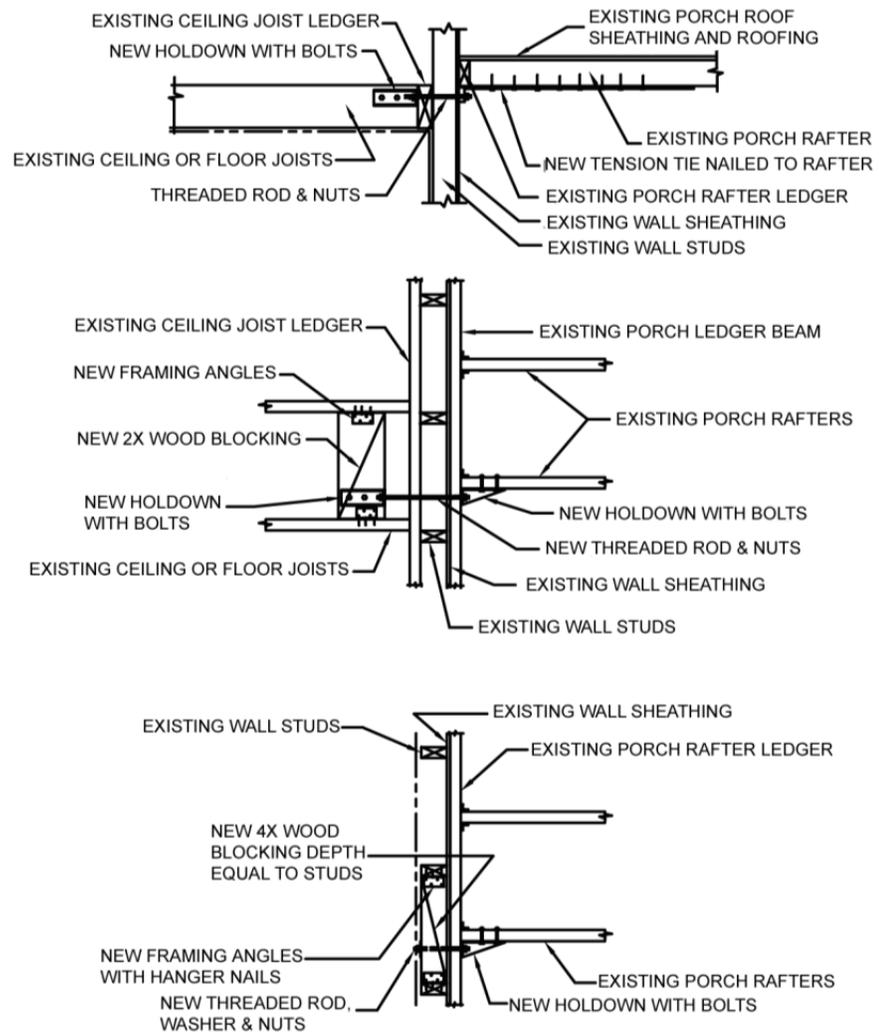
Schematic section and plan details of retrofit connections of porch roof framing to house framing (from ATC, 2002).
